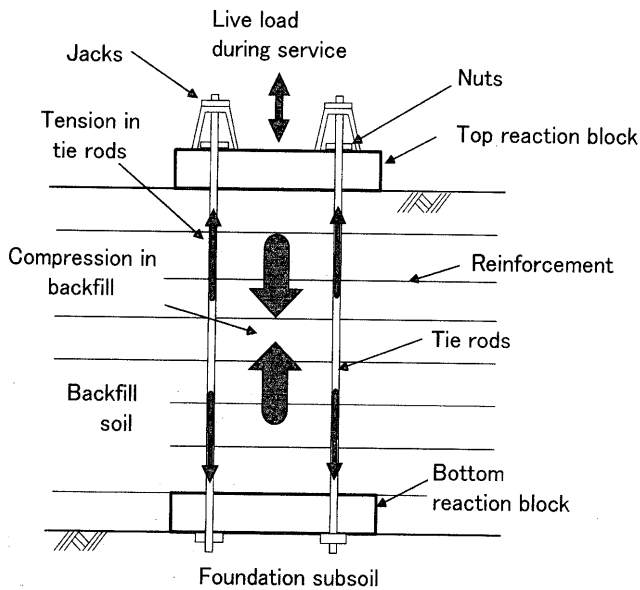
Schematic diagram of preloaded and prestressed reinforced backfill
